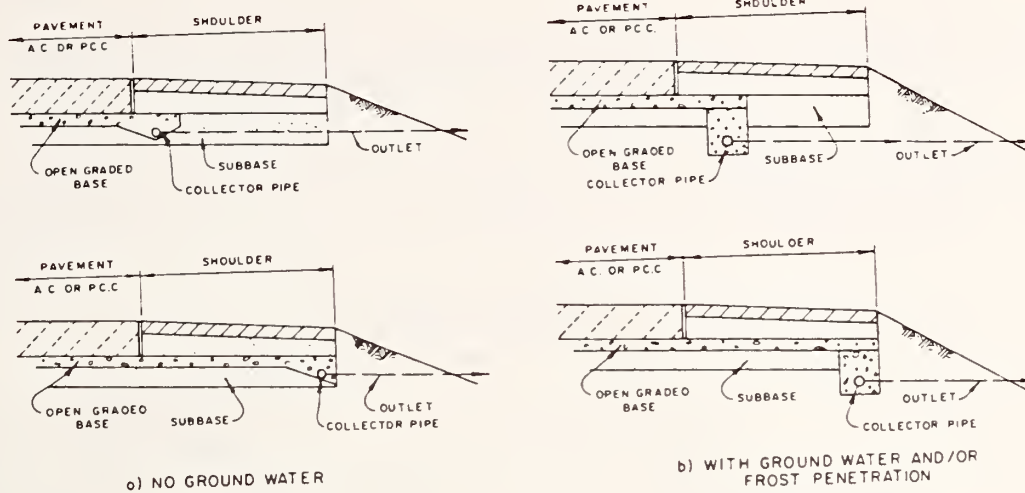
Typical Cross Sections of Subdrainage Systems (6).
